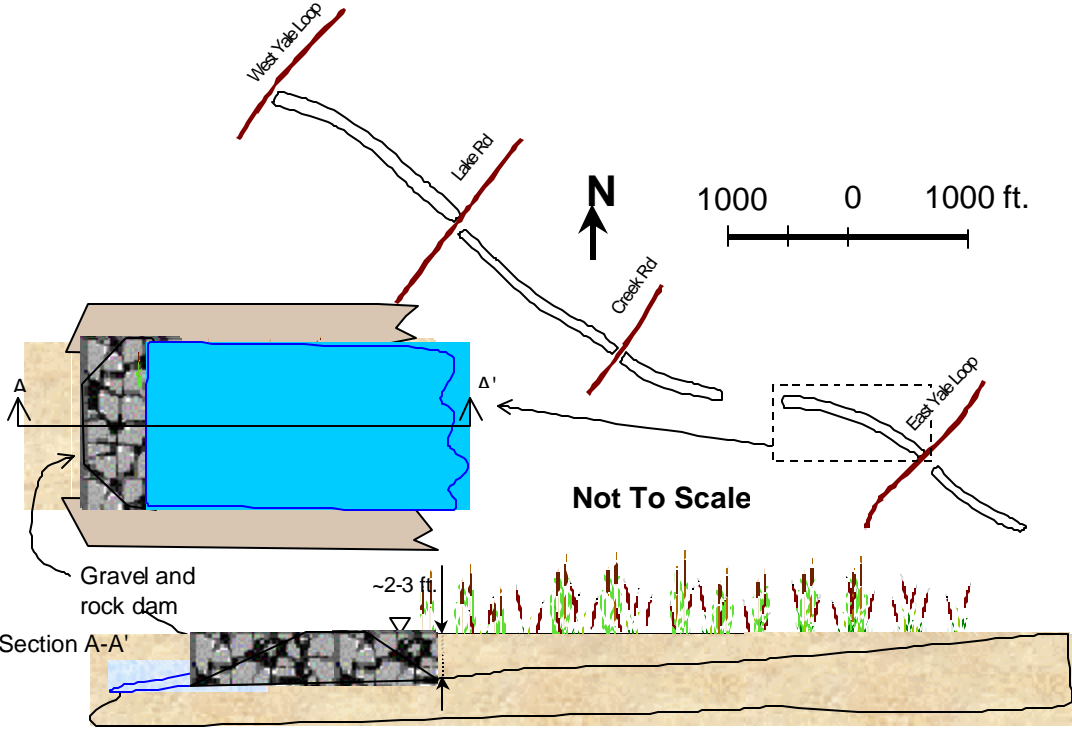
Conceptual Drawing of In-line Facility, showing a plan view along with cross-sections of the planned gravel and rock dams (2 to 3 feet in height).
